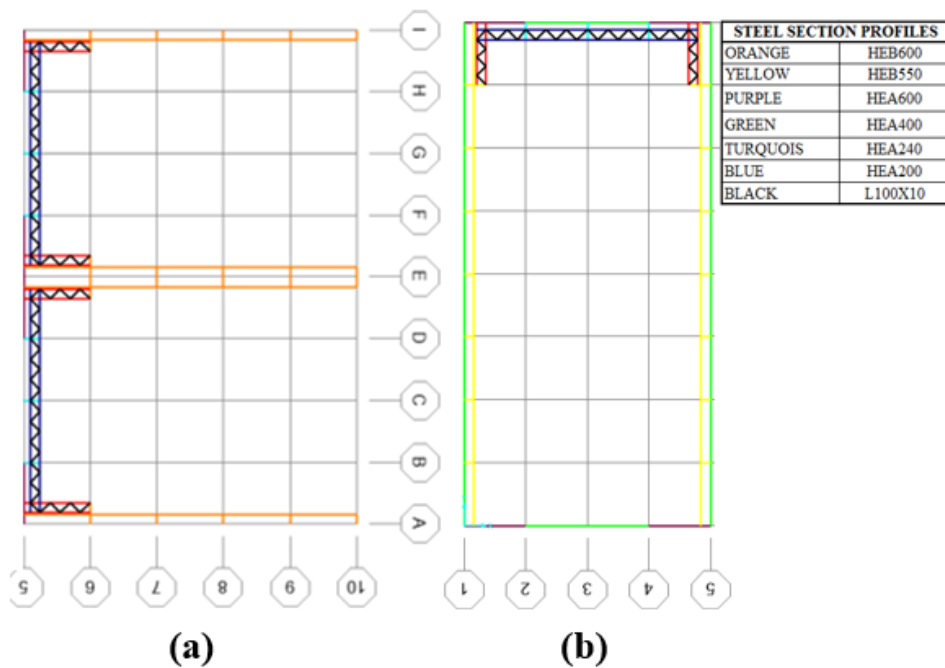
General Layout and the Steel Section Profiles at Crane Levels (a) 15.9 m
